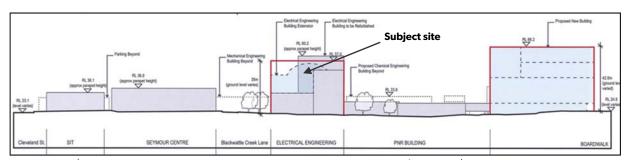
| CIP – approved building envelopes for Engineering Precinct (western / Maze Crescent Elevation (source: SSD 6123)
